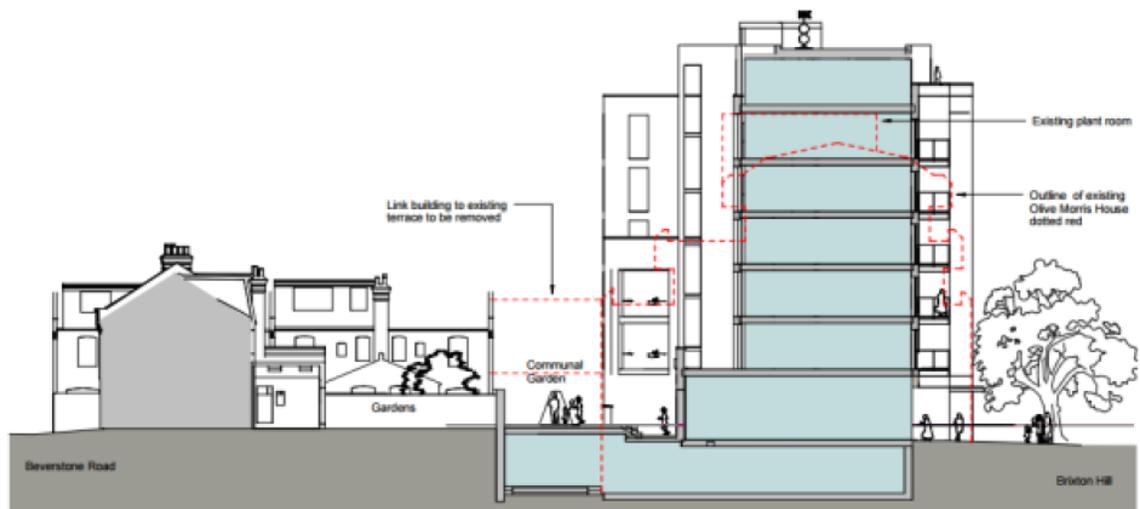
Cross section to show existing versus proposed massing, with a set back to both west and east elevations (In black and white print the dashed line illustrates the existing building outline):
